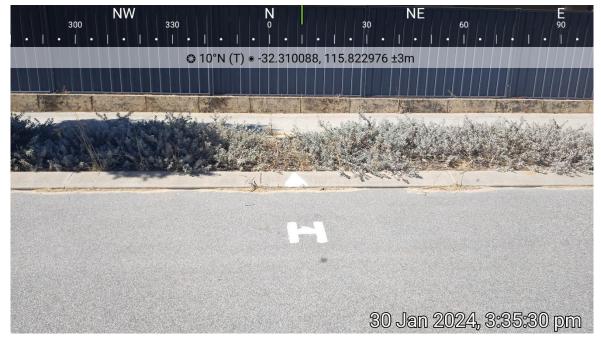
External Hydrant installed external to site (within 100 m of subject site).
